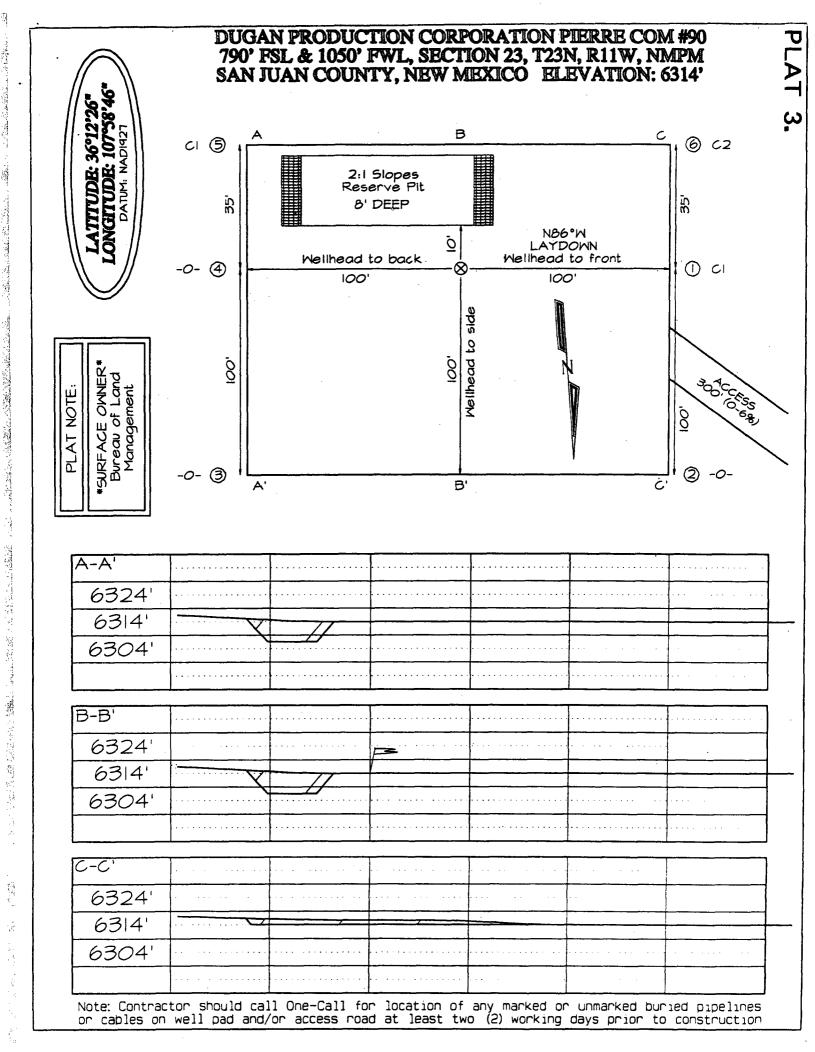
EXHIBIT B OPERATIONS PLAN Pierre Com #90
